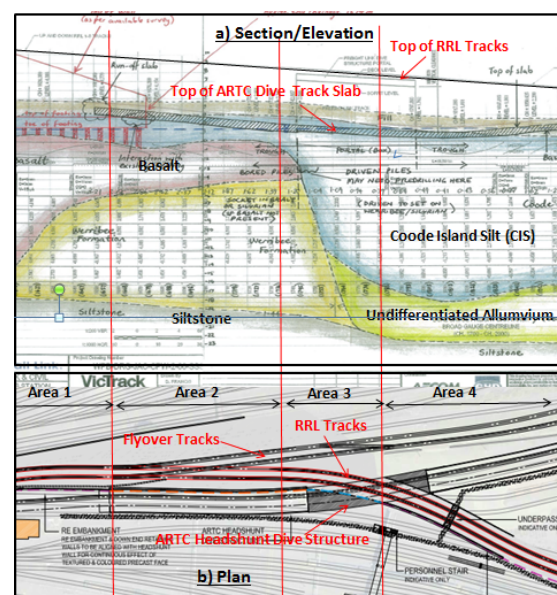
Layout plan and section/elevation - North Melbourne flyover embankment/ARTC Headshunt Dive
